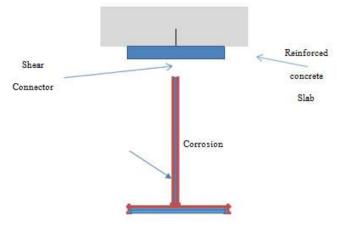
Composite Steel Girder Corrosion Model of Cross Section at Supports.
